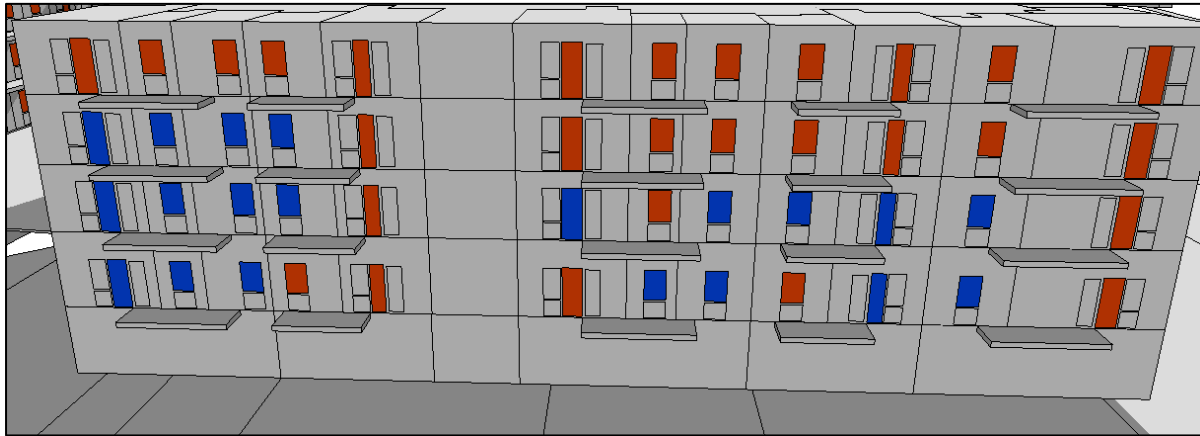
Windows achieving 1.5 hours of sunlight - Northwest elevation of Building 03 (modelling software)
